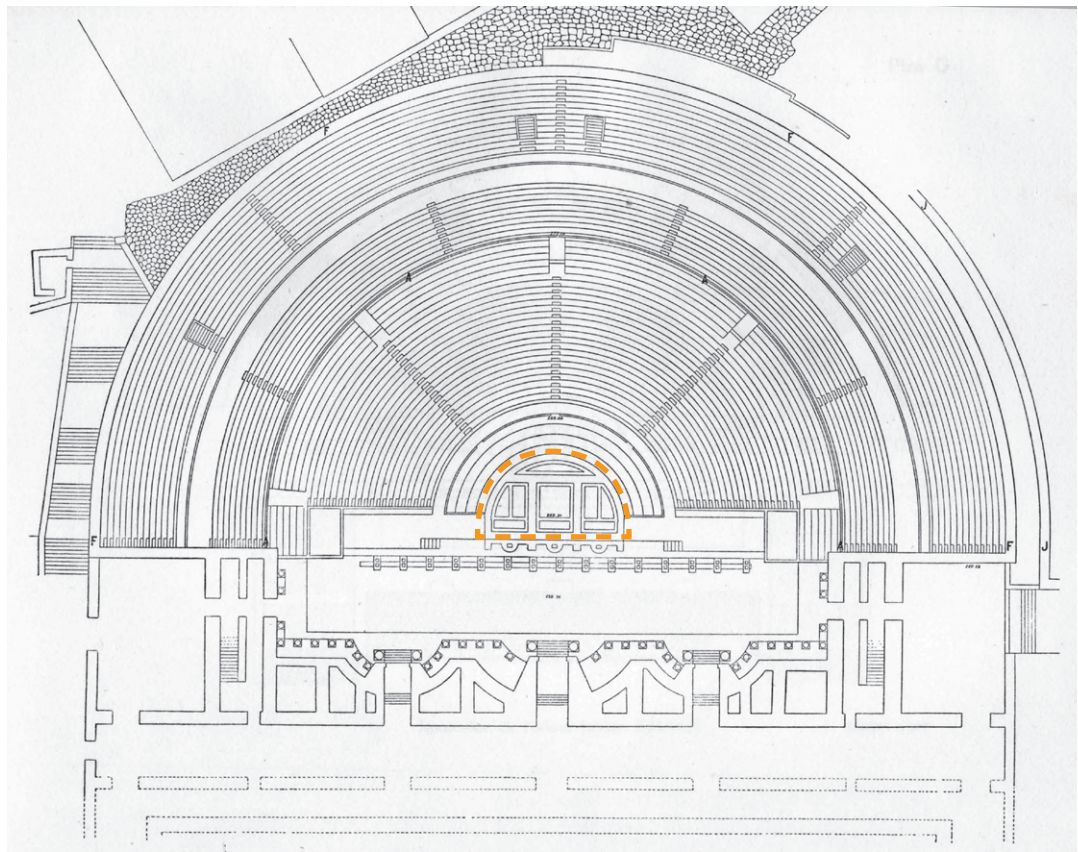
Plan and paving detail of Lyon's Augustan Theatre
